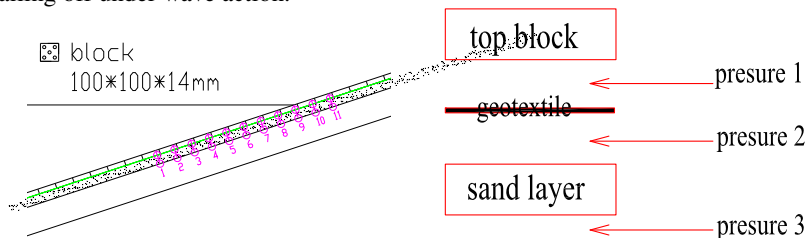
Pressure Measurement Point Arrangement at the lower part of Top layer/upper part of Filter layer and lower part of Filter layer
